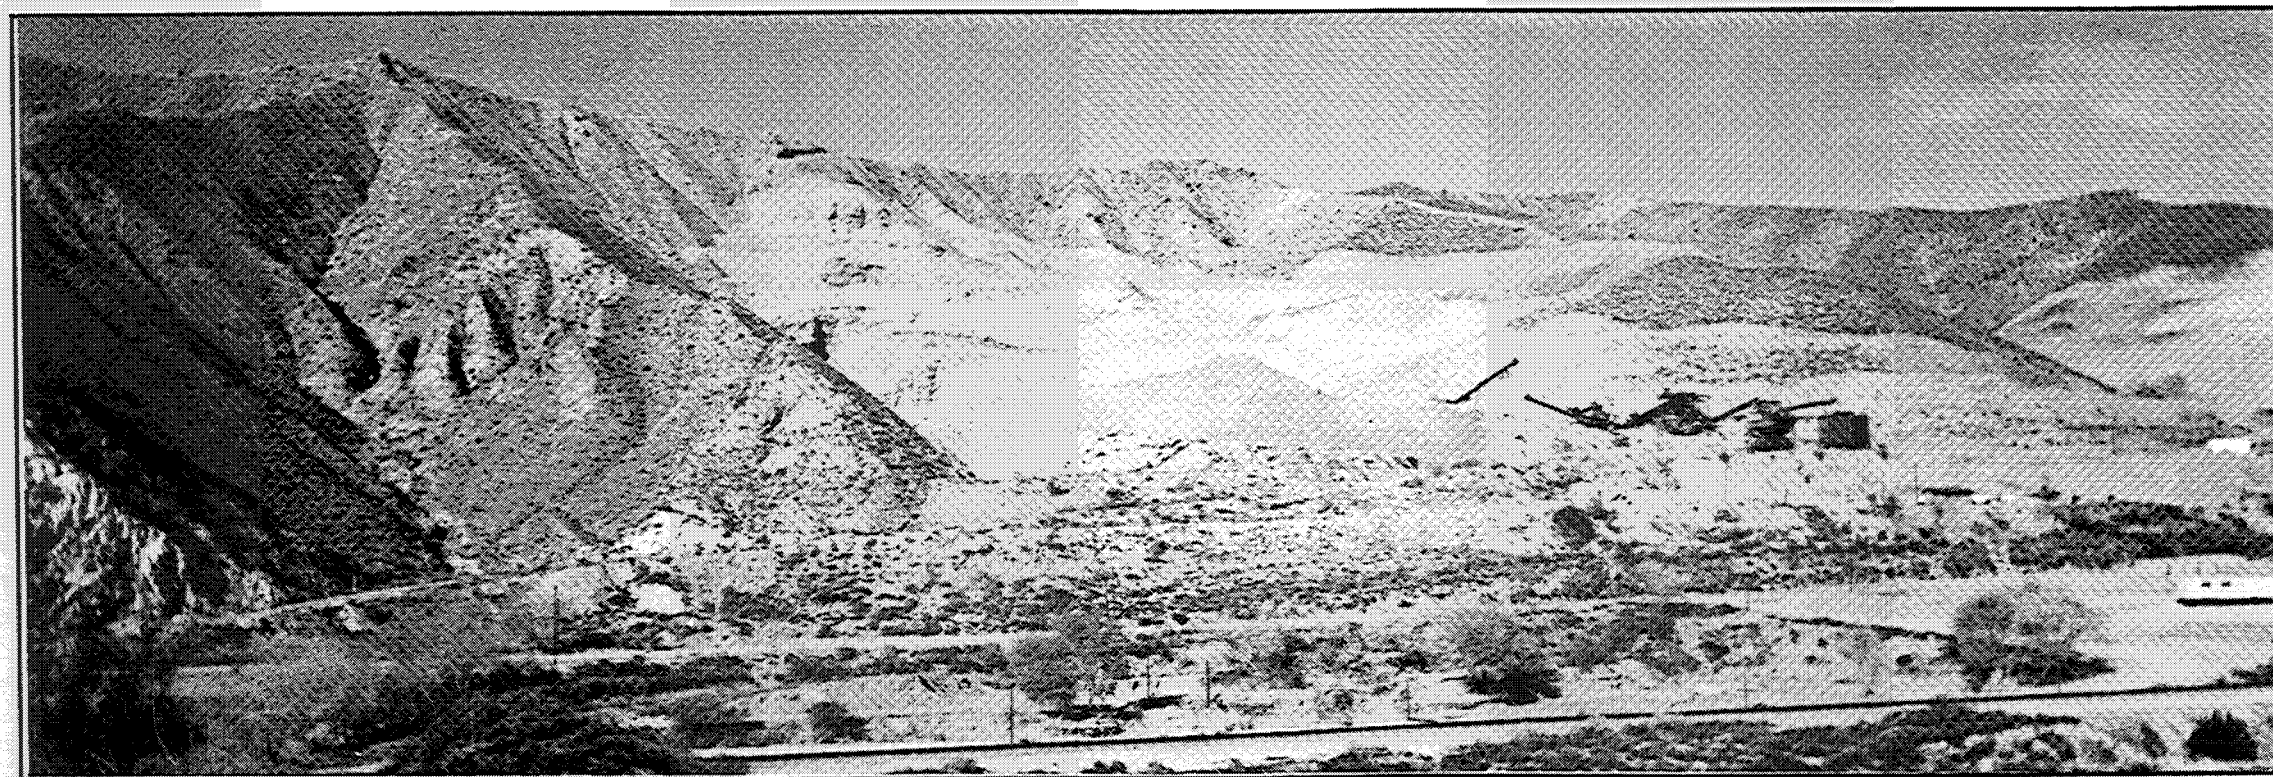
Southeastern portion of site, looking north, showing existing mining operation. Southern Pacific Railroad in foreground.
